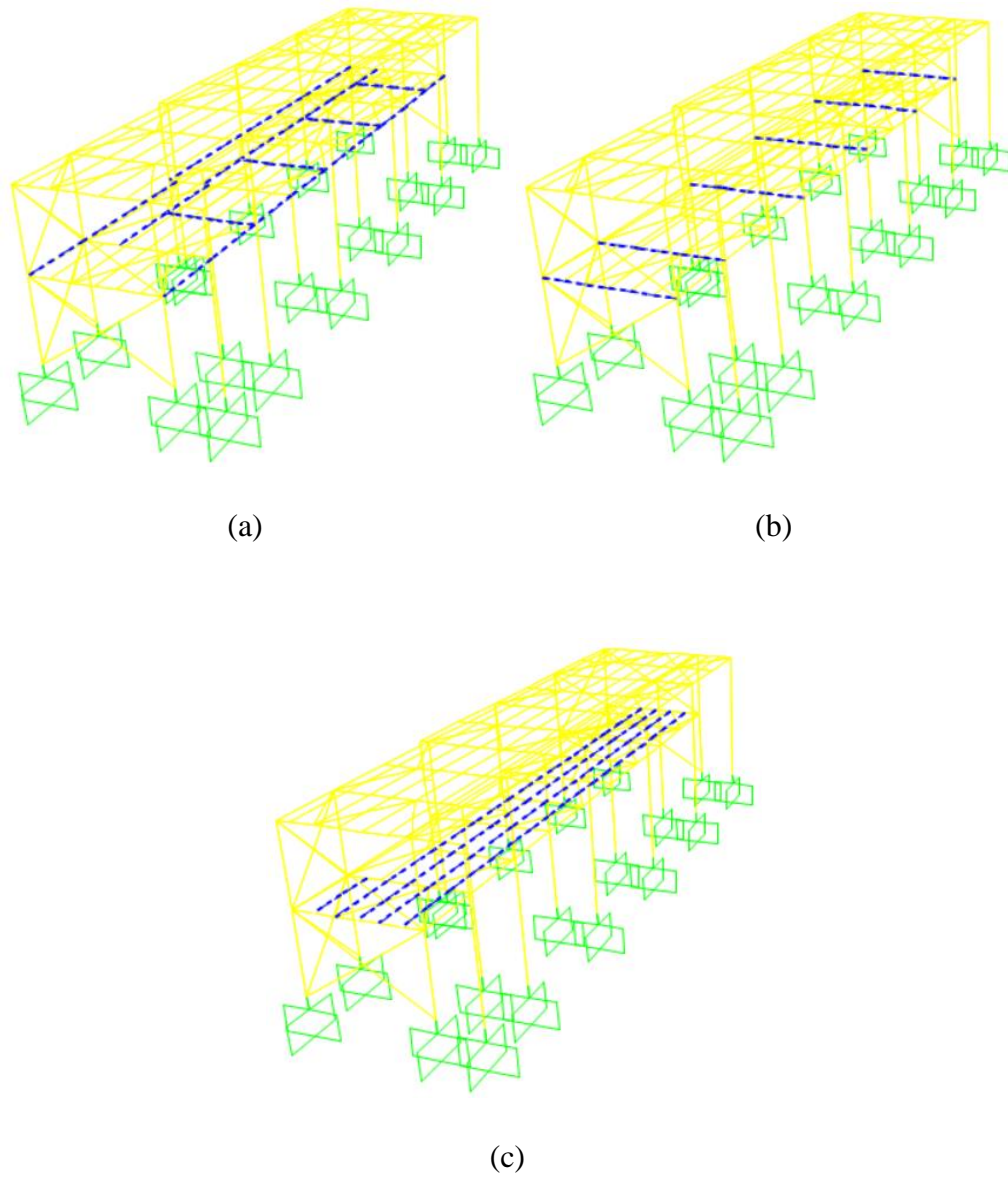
The first floor girder and beam member groups for the 551-member steel frame: (a) the first floor girders1, (b) the first floor girders2, (c) the first floor beams1.
